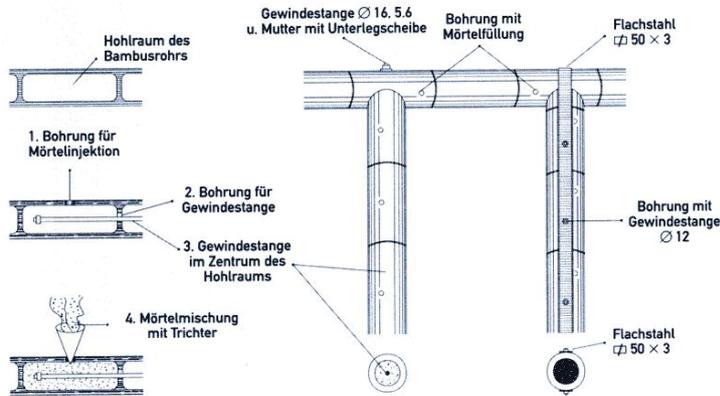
Technical Details from ZERI Pavilion Construction in Germany Pavilion
